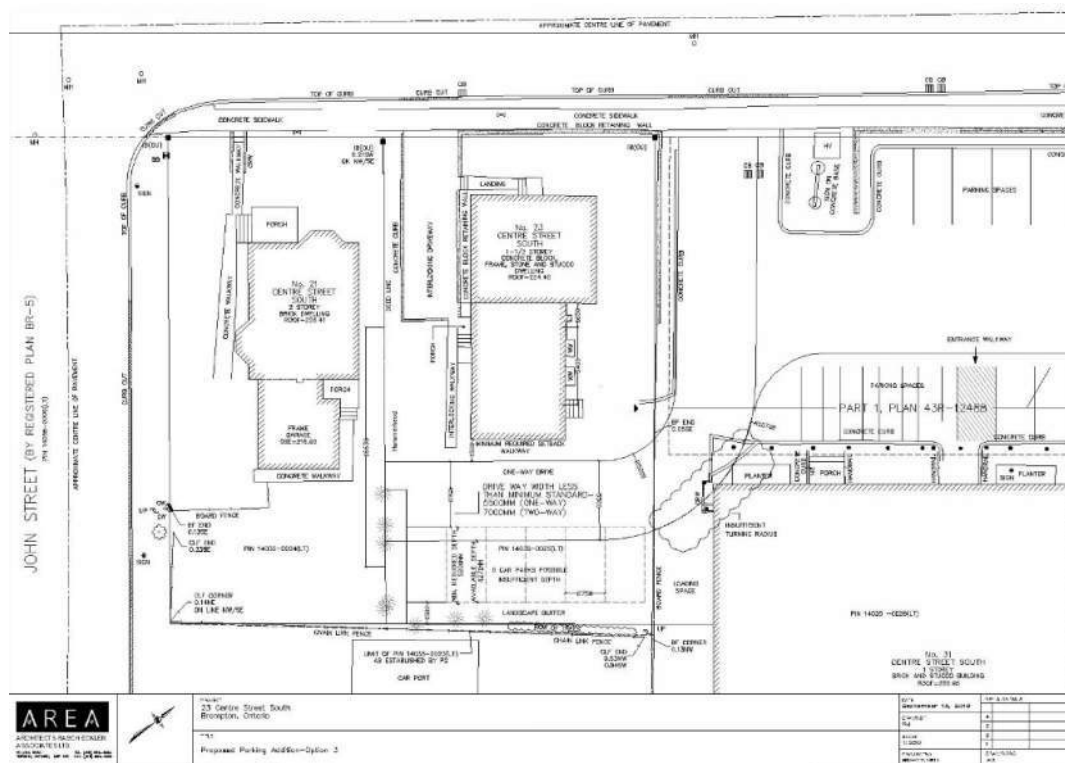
Option 3: Site Plan Drawing showing proposed additional parking side-access retaining the rear wing
